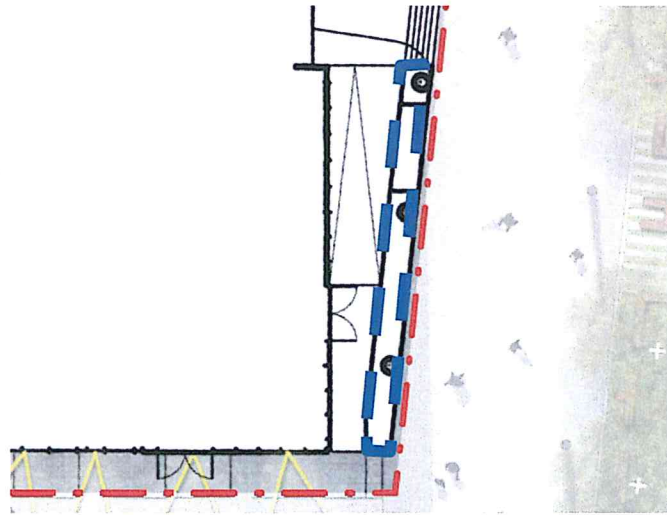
South east corner of the building (Source: Applicant's Response to Submissions)
